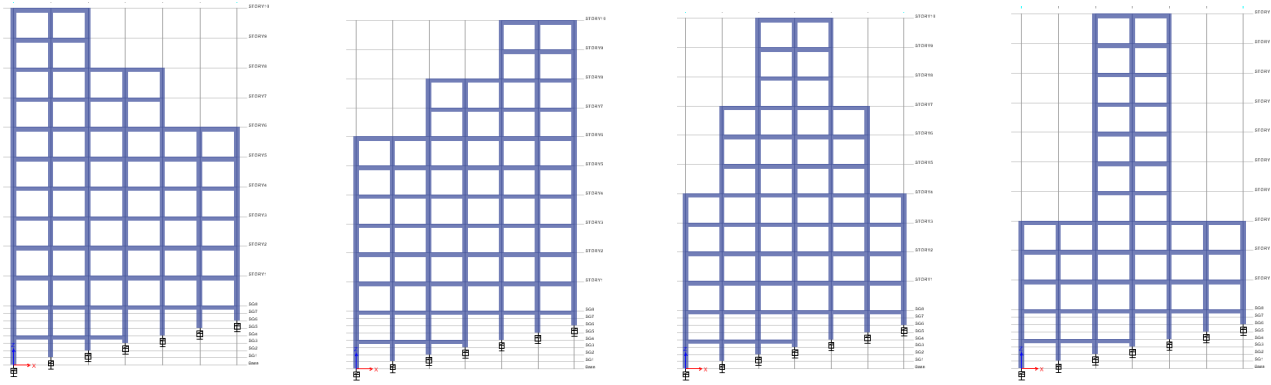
Elevation for model 7 Fig.9 Elevation for model 8 Fig.10 Elevation for model 9 Fig.11 Elevation for model 10
